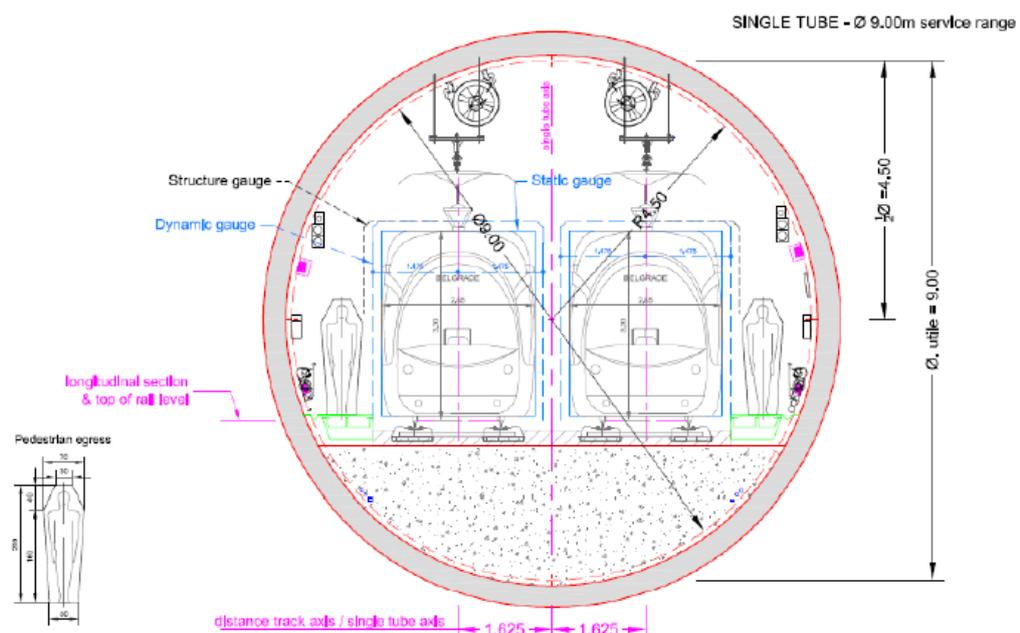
Typical single tube 1 level tunnel cross section: straight alignment
